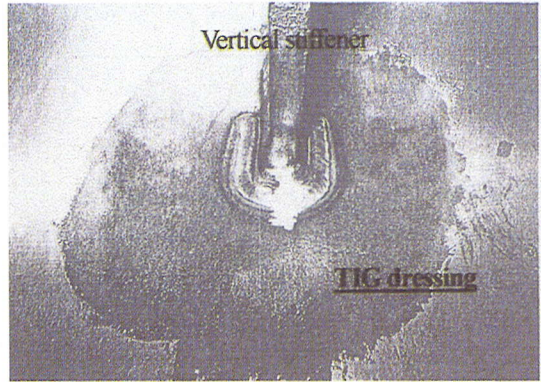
Example of "Repair D" performed by 1 pass fillet weld and TIG dressing in Shinkansen bridge.
